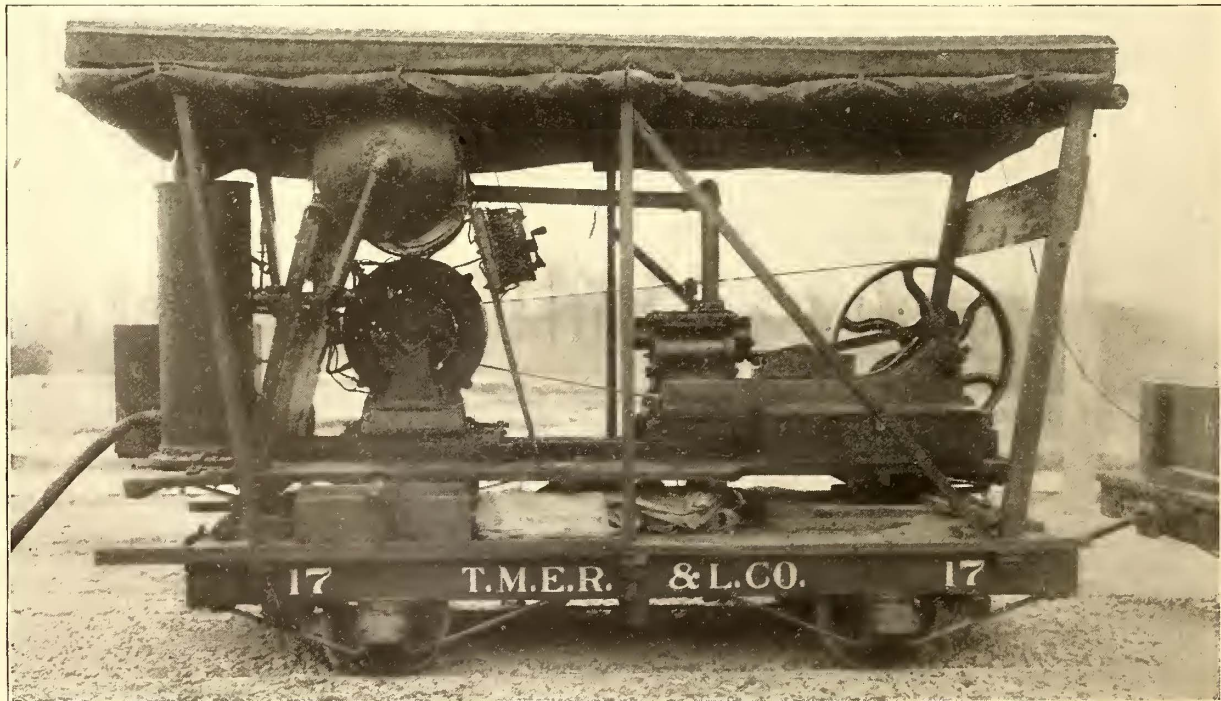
SAND-BLAST CAR, CAST WELDING IN MILWAUKEE
